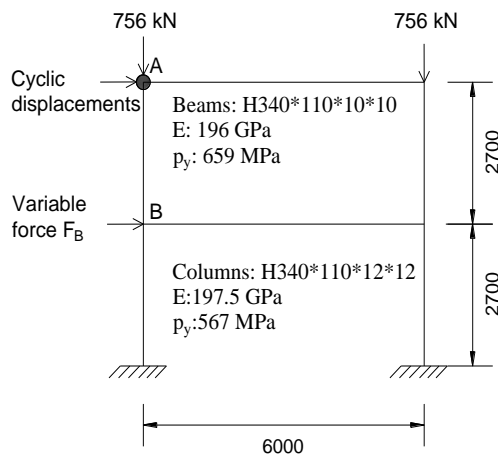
Layout and loading pattern of the high strength steel frame (Unit: mm)
